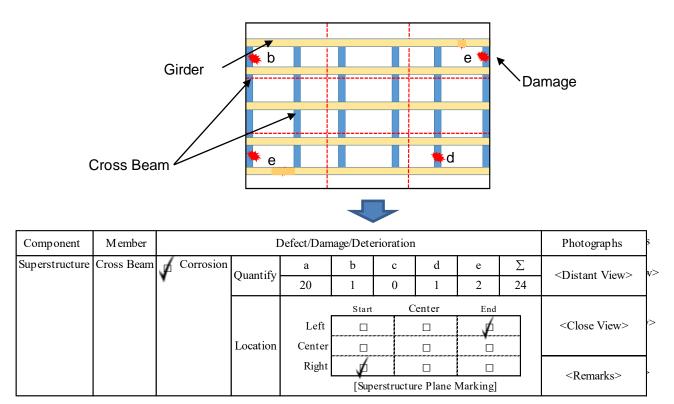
Corrosion (Cross Beam of Steel Bridge)
